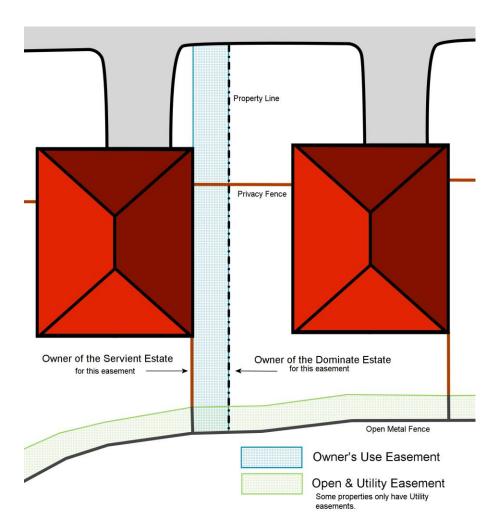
Typical layout of Utility, Open Space, and Owner's Use Easements.
